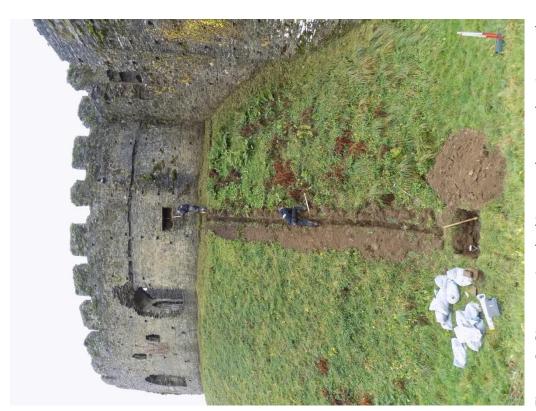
Site overview looking south west showing conductor tape trench and earthing plate pit.
